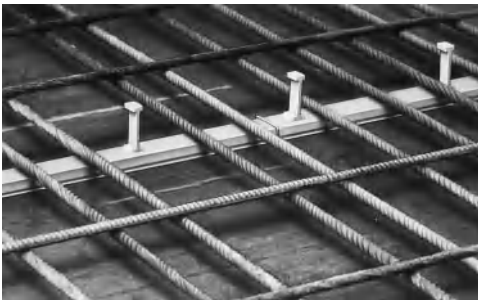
Cast-in-place channel anchor (Eligehausen, Mallee, Rehm (1997))
